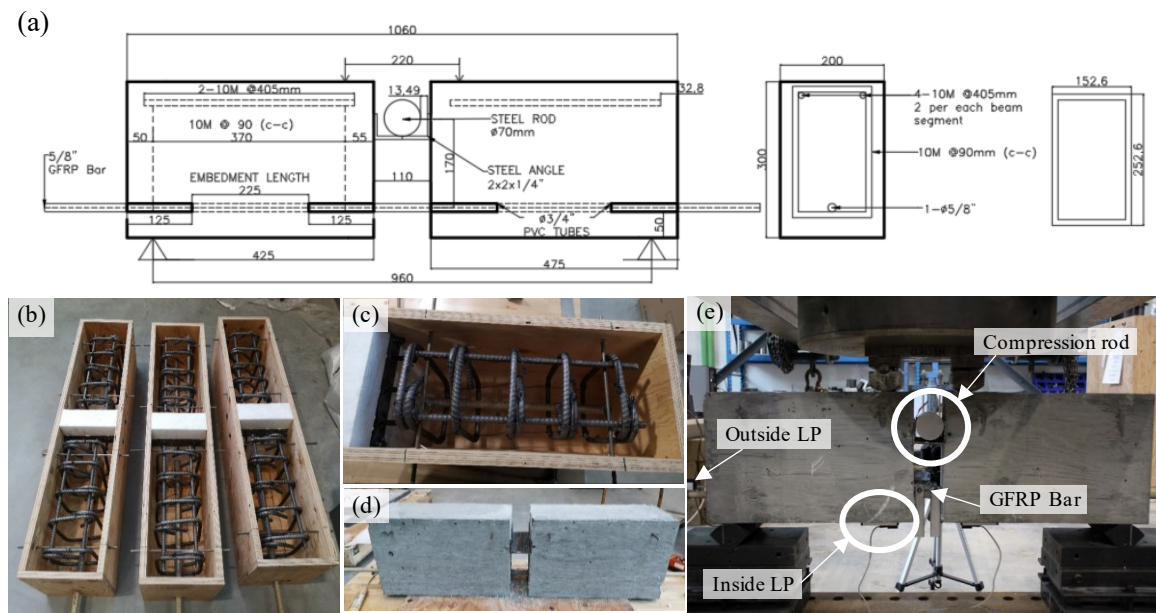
(a) typical RILEM beam geometry and reinforcement layout used in this study. All dimensions in mm, unless specified; (b) and (c) Fabrication of RILEM beams; (d) final product after formwork removal; and (e) Test setup for RILEM beam tests.
